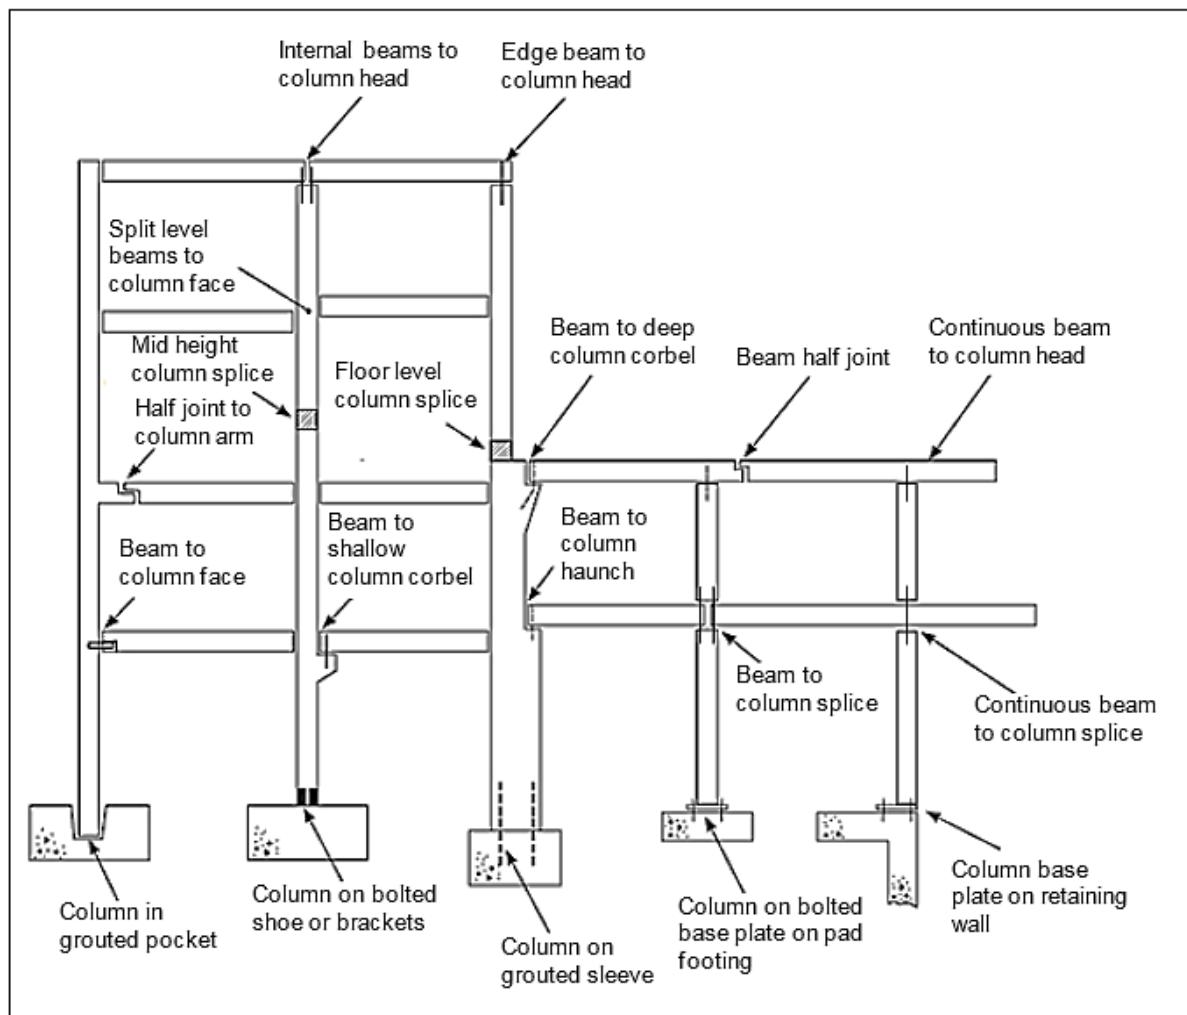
Types of connections in the precast concrete structure (Elliott, 2002).
